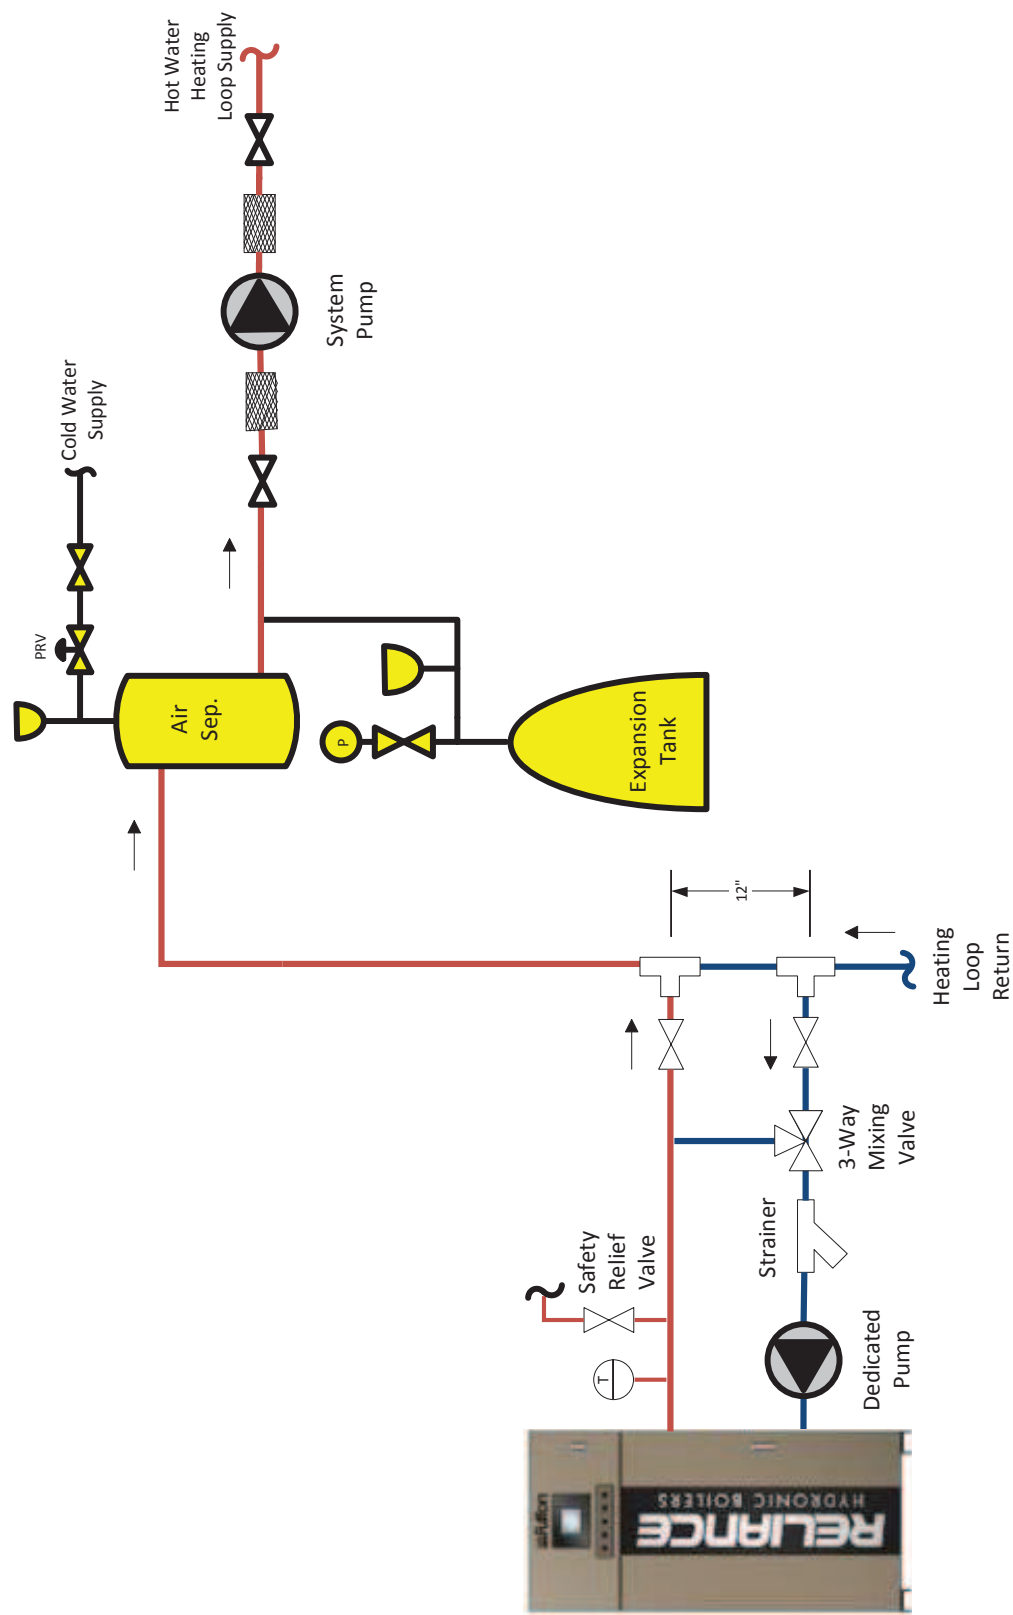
SAMPLE PIPING LAYOUT: SINGLE BOILER APPLICATION, WITH MIXING VALVE
